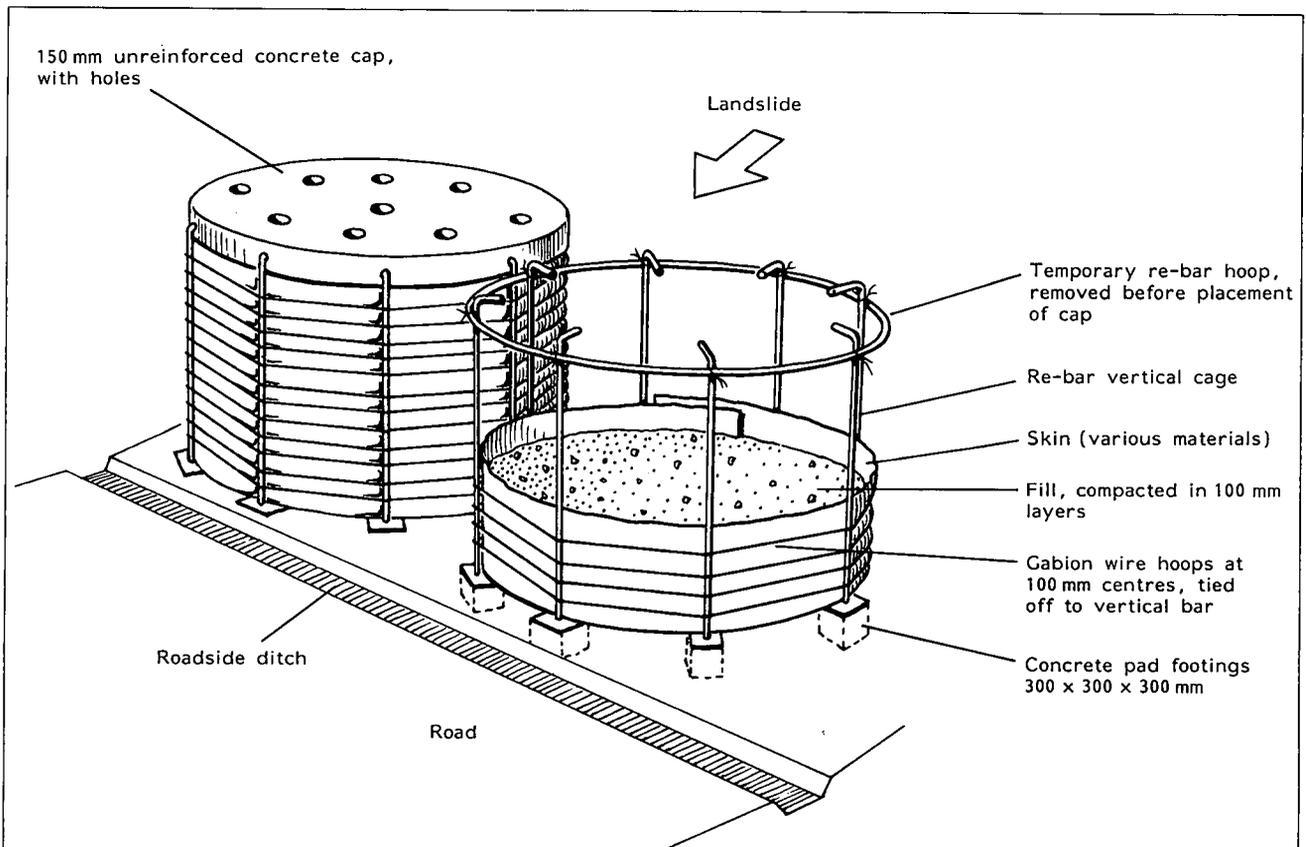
Schematic drawing of cylinder design and method of construction. The skin and fill are placed in lifts. In the revised design the structural concrete cap was replaced by a masonry weather capping
